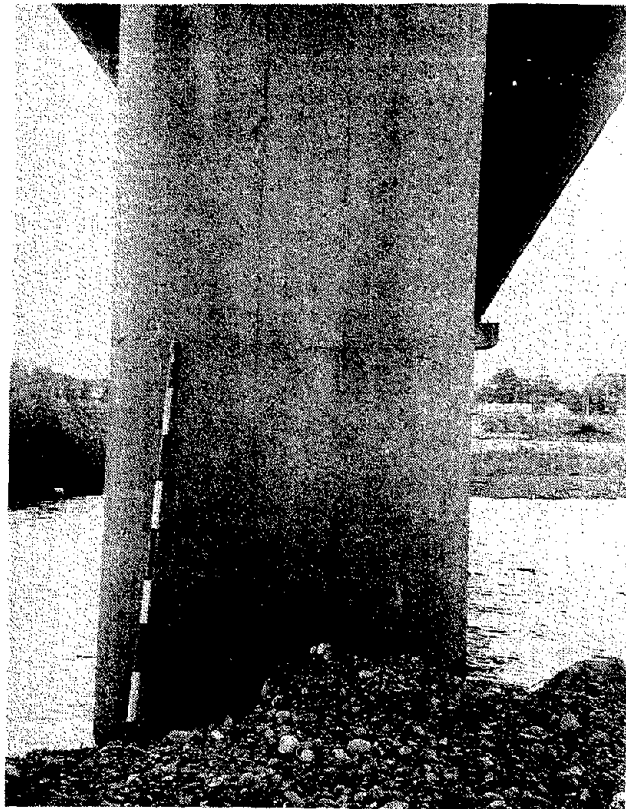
Damage of Shin-shiriuchi Bridge at The Second Termination Point (Old P2)
